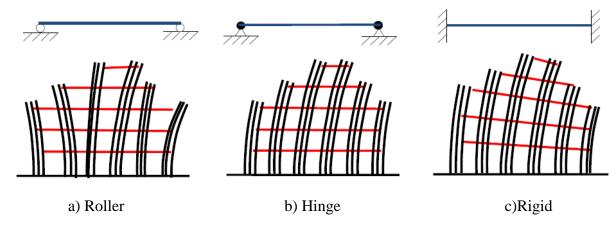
Types of Sky Bridge connections between skyscrapers (McCall 2013)
